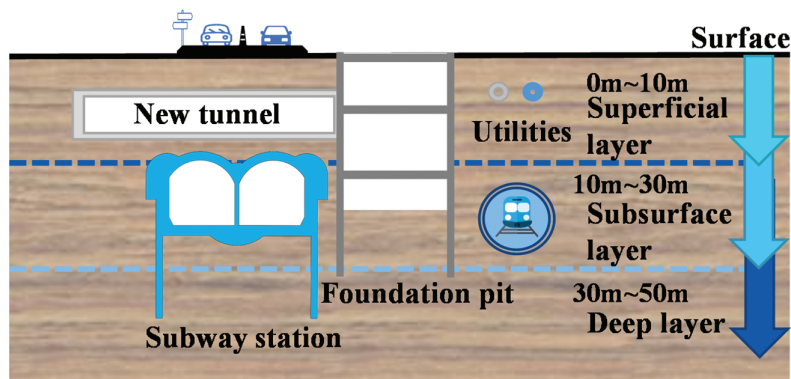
Schematic diagram of tunnel and foundation pit to existing subway station
